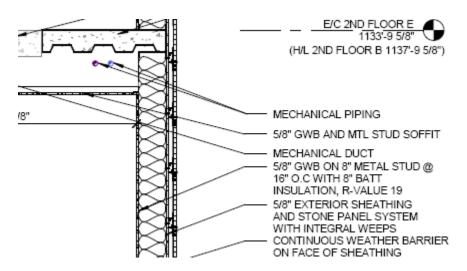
Wall Section at Large Projection Stone Panels | AE322
